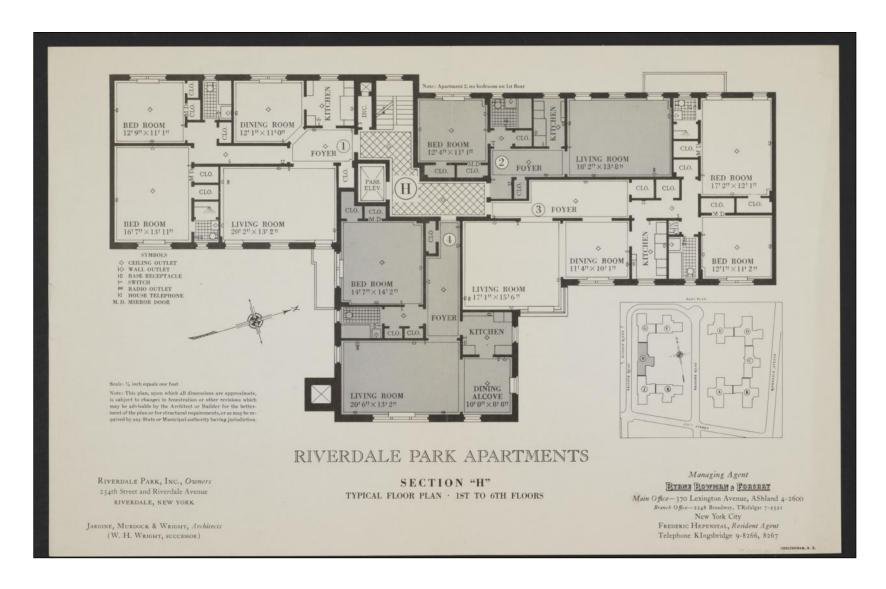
Typical floorplans in Section H of the Riverdale Park Apartments (Jardine Murdock and Wright 1939).
